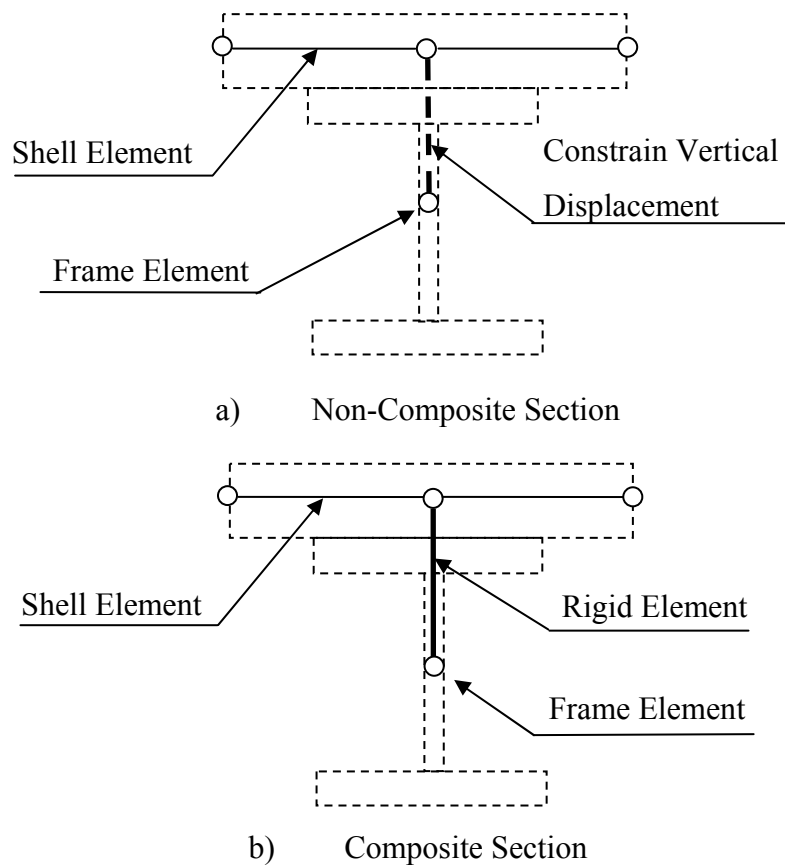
Cross Section of Three-Dimensional Finite Element Model for U.S.-20 Bridge
